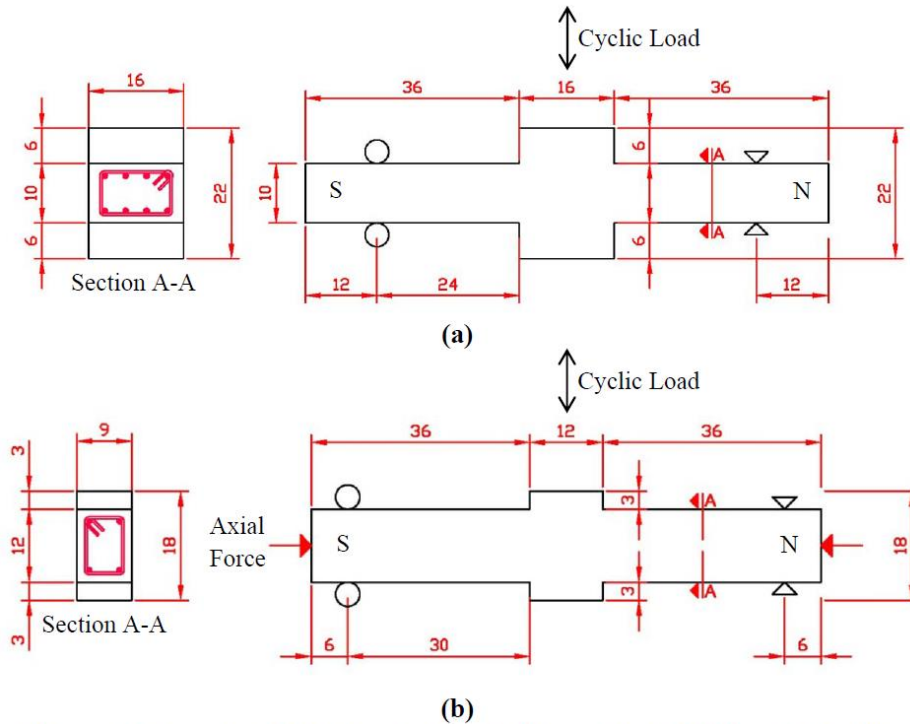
Geometry of Test Specimens, (a) Beams Tested at Penn State, (b) Columns Tested at Purdue (all dimensions in inches)
